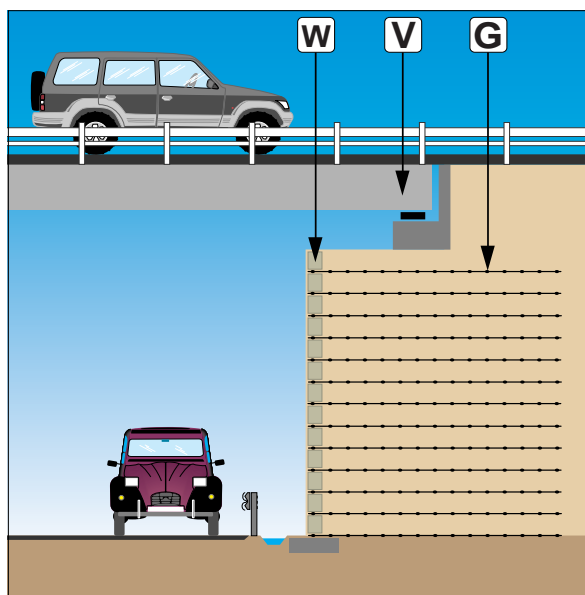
Typical geogrid reinforced wall for bridge abutment.
